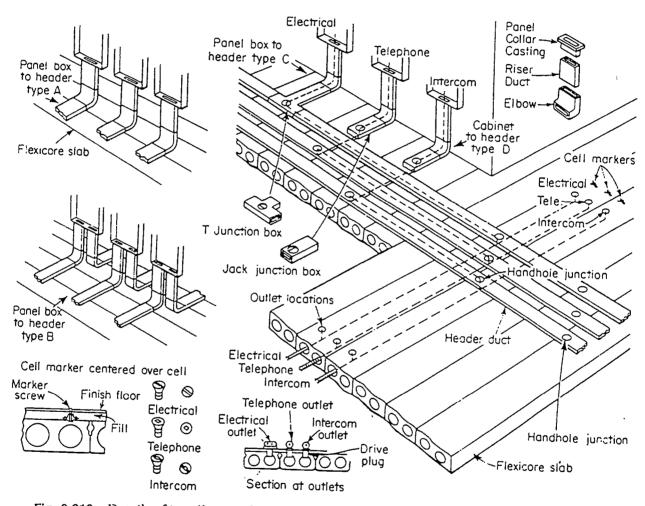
Details of installation of a cellular-concrete-floor raceway. The Flexicore Co., Inc.;
